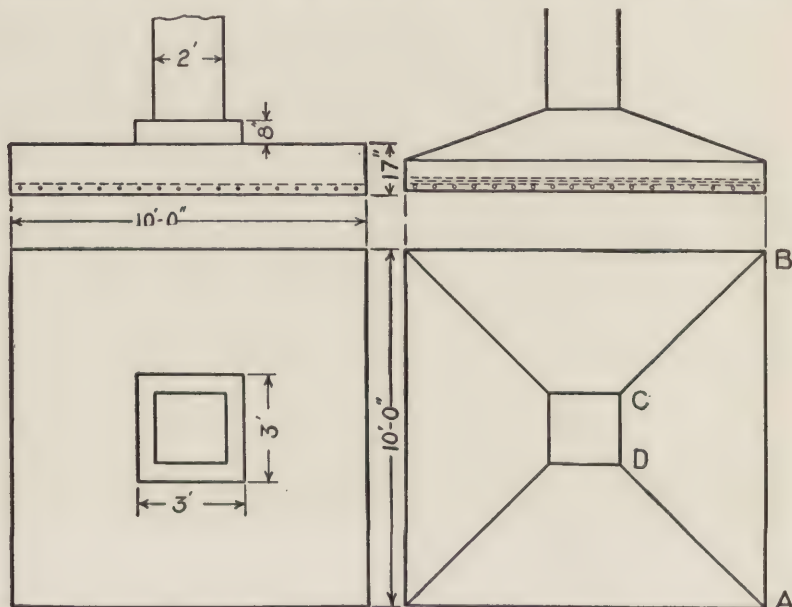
Footing with Stepped Base. FIG. 134.—Four-way Reinforcement.
